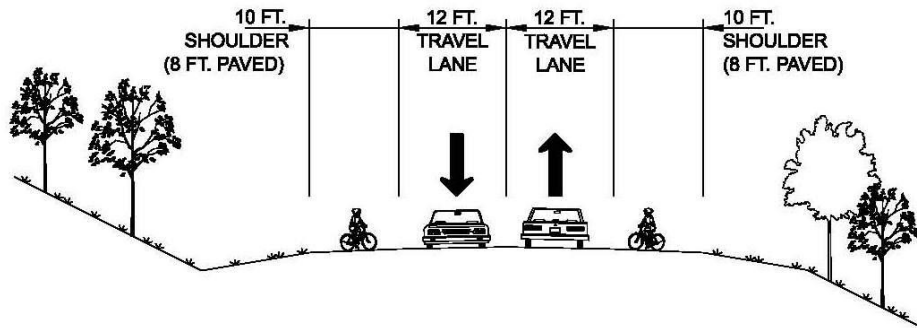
SEGMENT 5 PROPOSED TYPICAL SECTION
